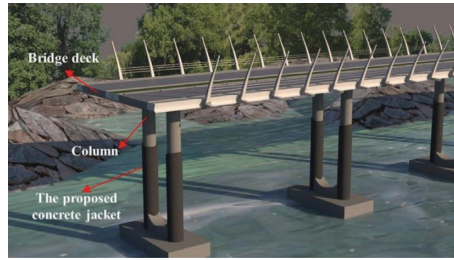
A schematic picture of the place where the concrete jacket is used for bridge columns.
